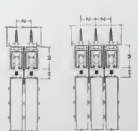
Cross-section showing overhead bracket attachment with weatherstrip of two parallel sliding doors, and of three parallel sliding doors.
